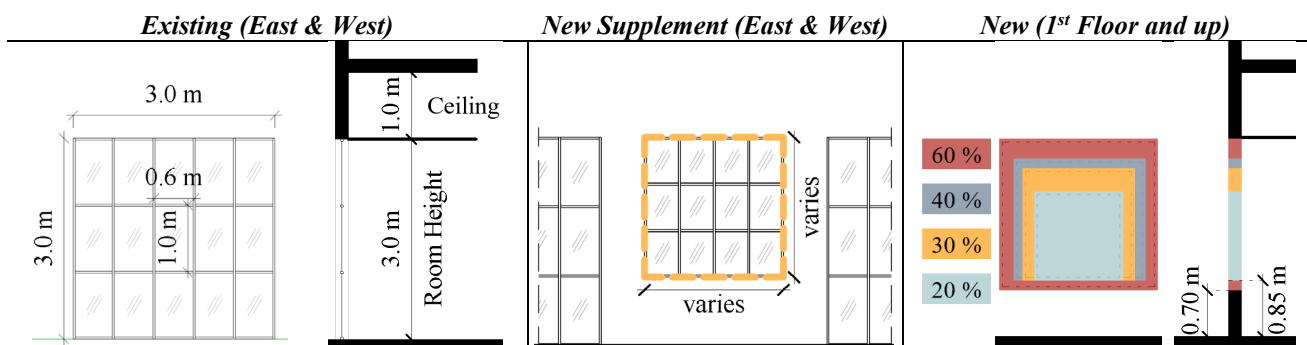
Existing (left) and new (right) side lighting geometry principles. Elevation (left) and section (right).
